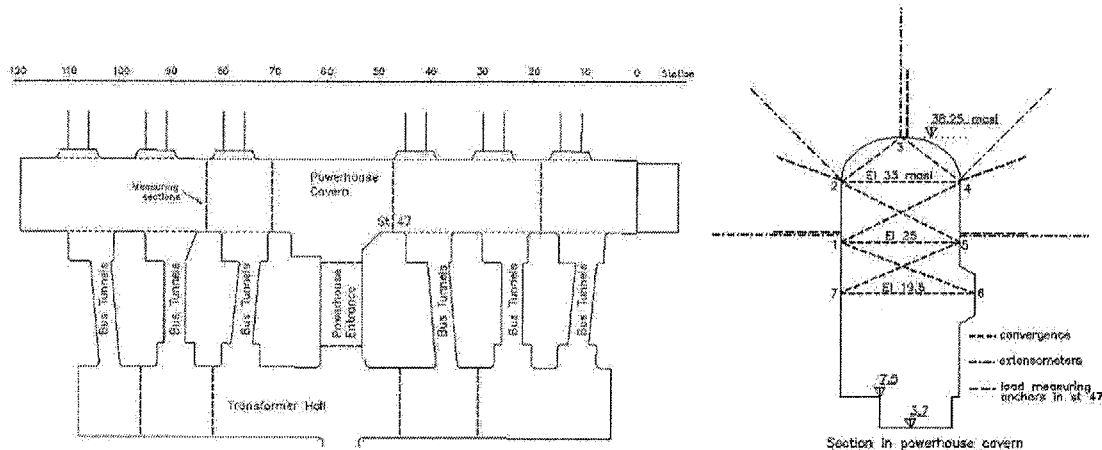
Location and layout of the deformation measuring sections in the powerhouse cavern, transformer hall and powerhouse entrance
